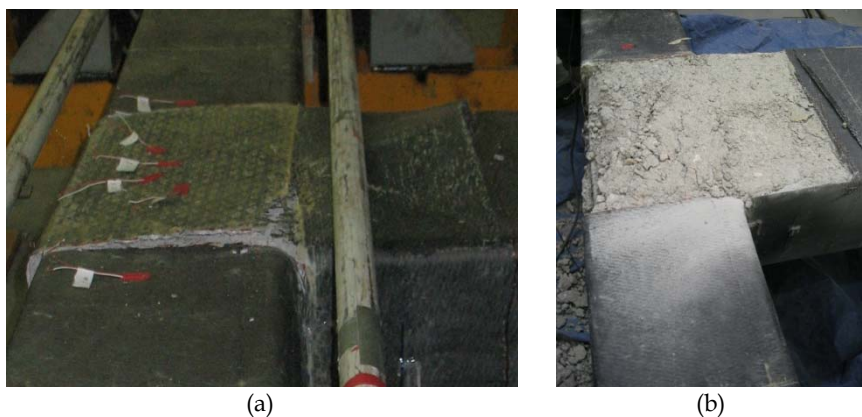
T_FS1: failure mode a); crack pattern after FRP removal b)
